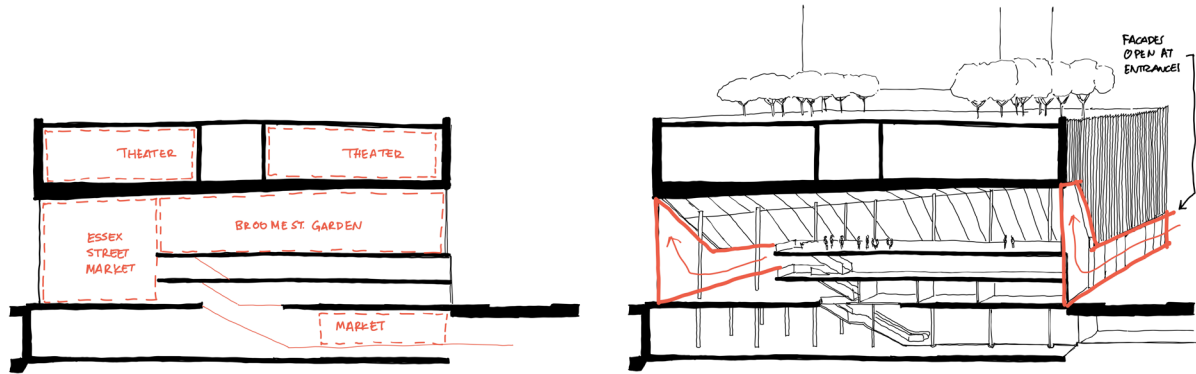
Sections Highlighting Interior Spaces (developed by author)
